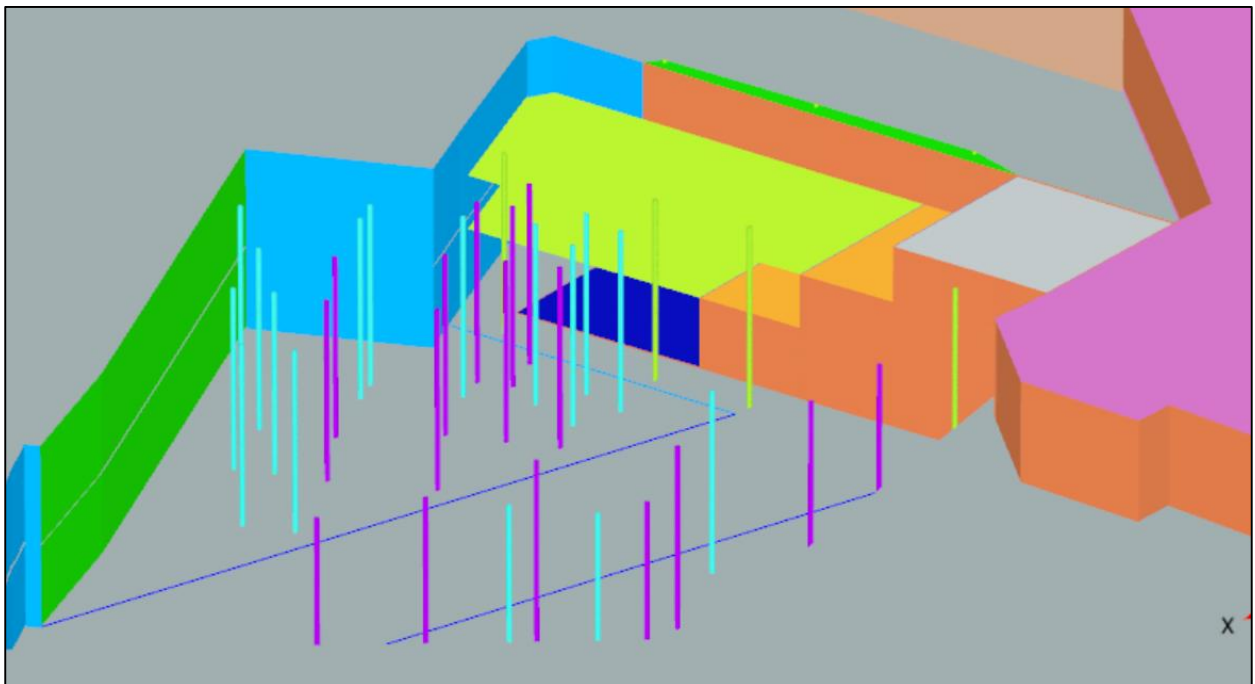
Stage 6 – Excavation to B1 level after installation of piles and plunge columns.
